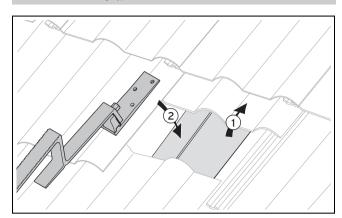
Exposing the rafters and fitting the type P roof bracket
